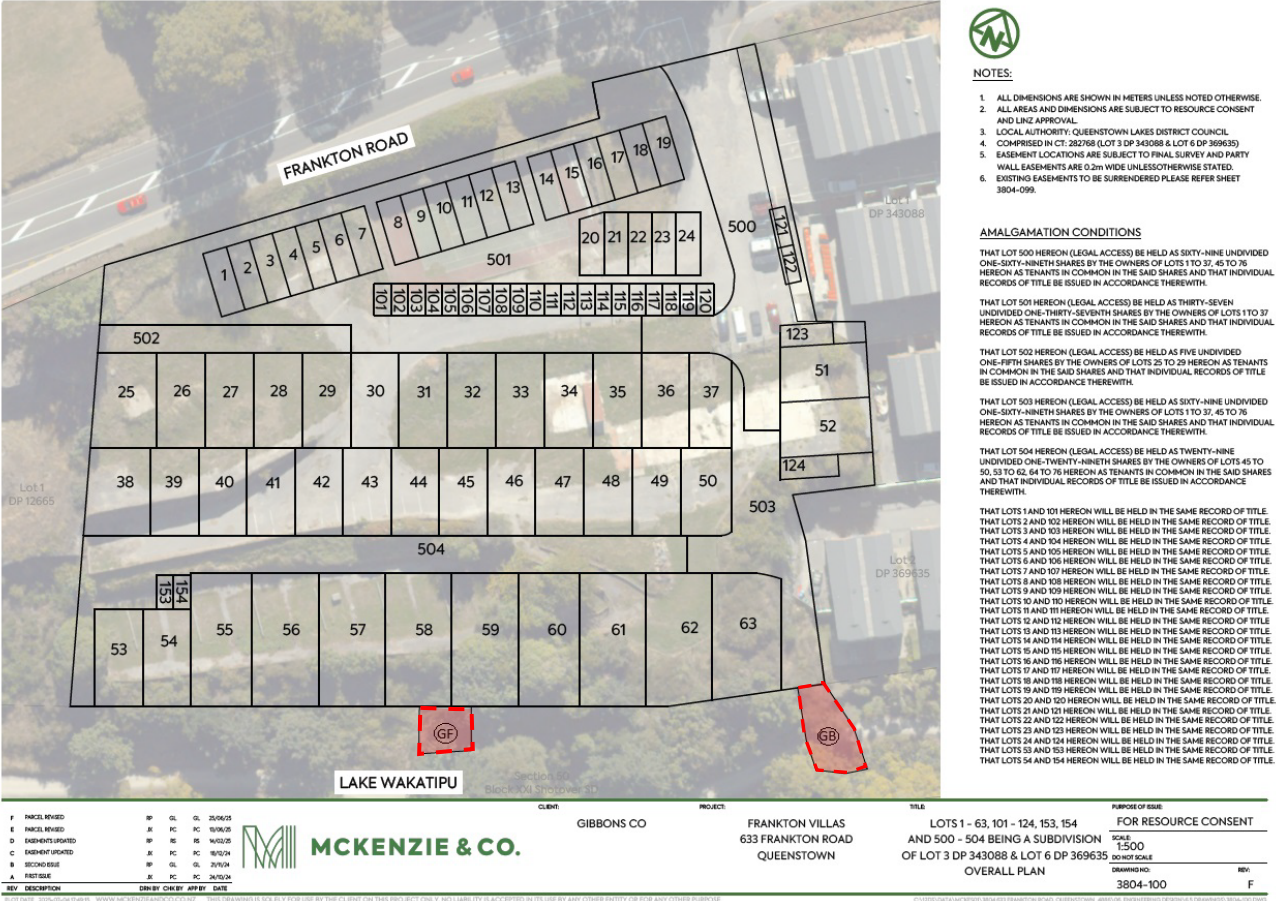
Aerial Plan of Proposed Development and Easement Areas GF and GB
